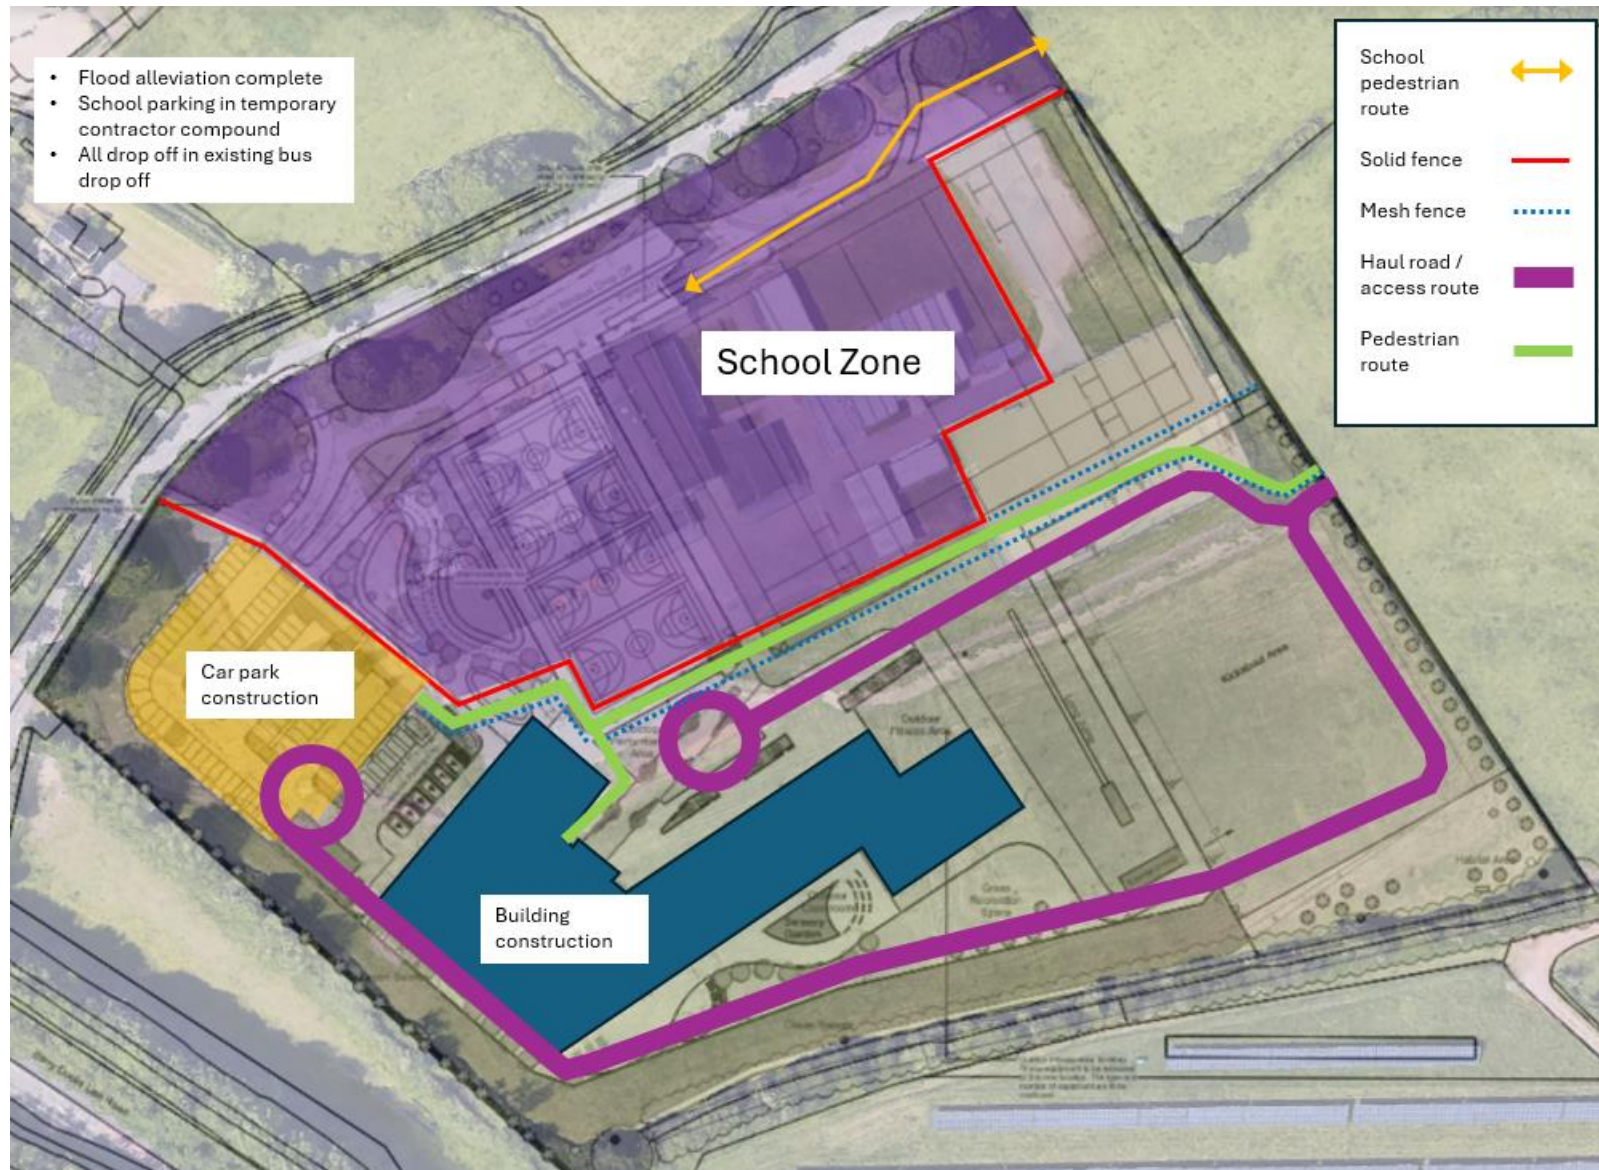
Site Logistics Plan for completion of the car park and the building construction
